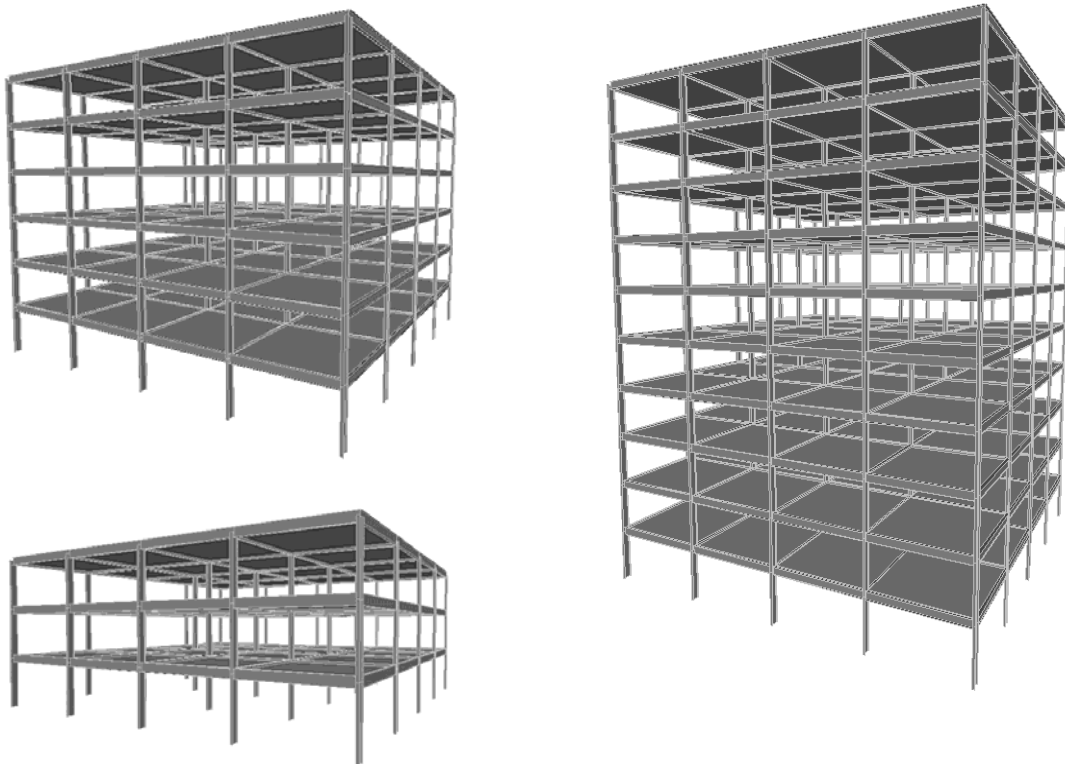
Structural outlines of the buildings analyzed in this study (3, 6 and 10 floors).
